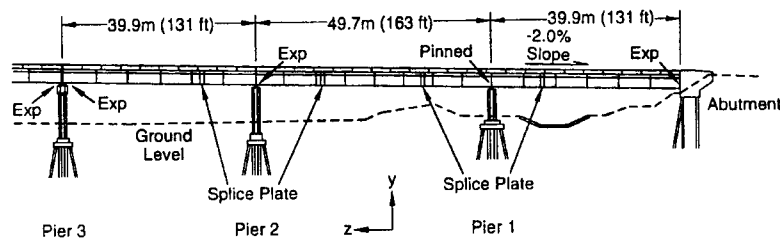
Elevation view of the portion of the I-40 bridge that was tested.
